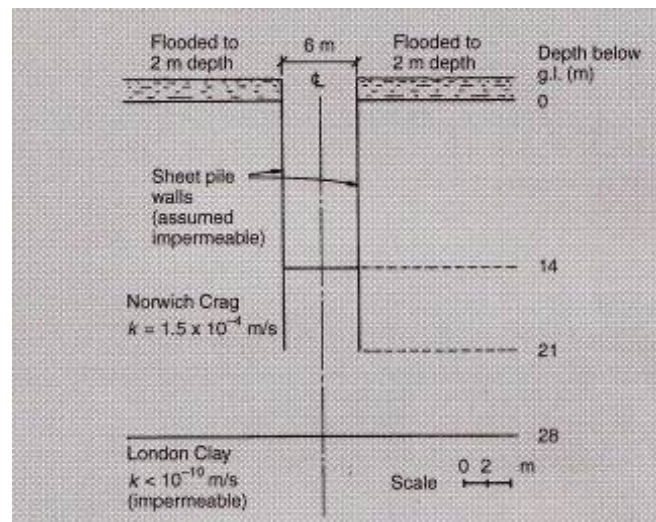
Geometry for example flow net construction: excavation for cooling water outfall pipe. (Powrie, 1997)
